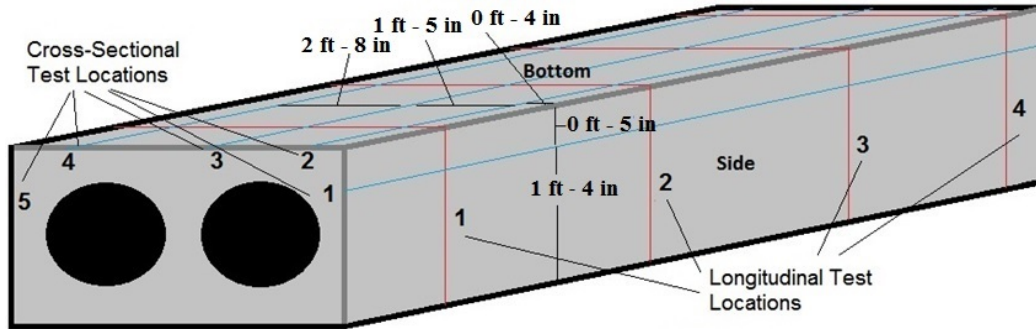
Test Locations on Voided Slab of Qualla Road Bridge
